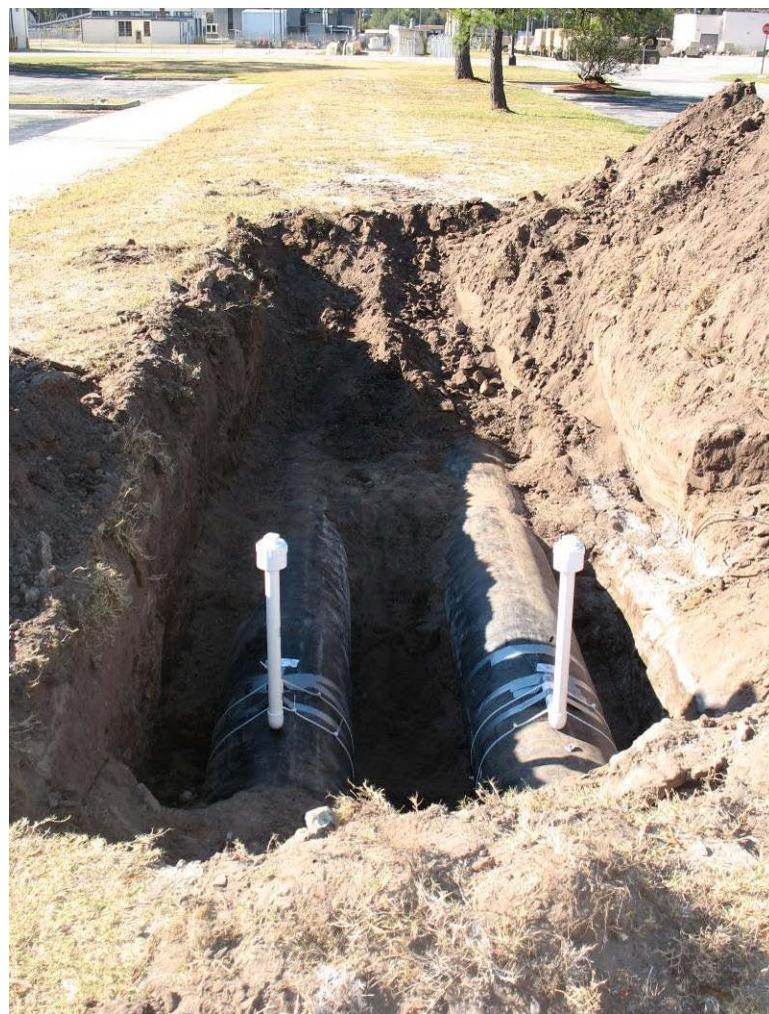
Site 3 excavation with installed instrumentation, facing west.
